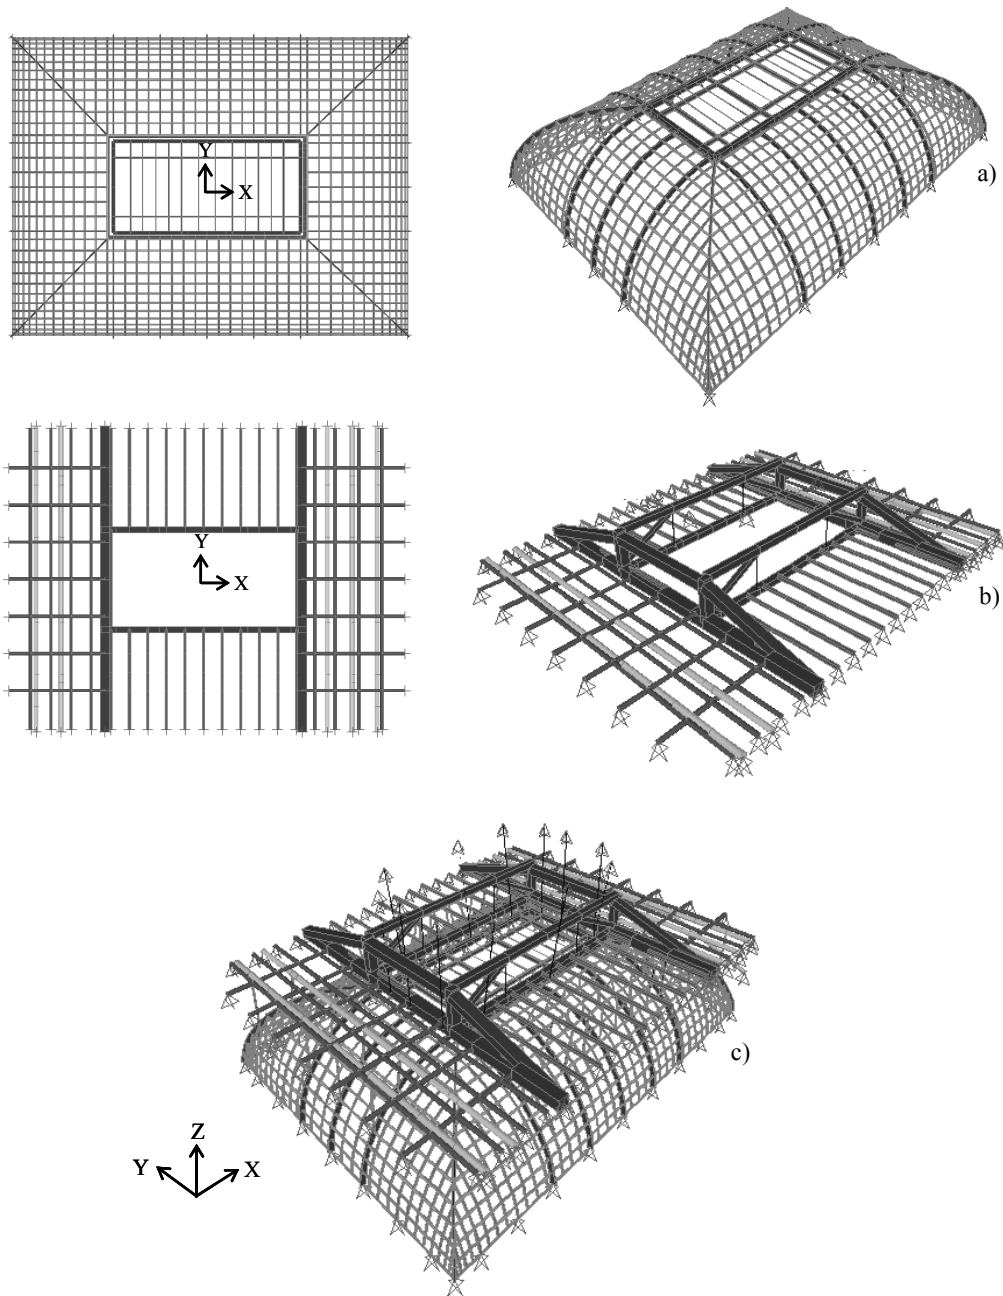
Guard Room (XXIX) – Structural modelling: a) Vault; b) Floor beam; c) 3D model.
